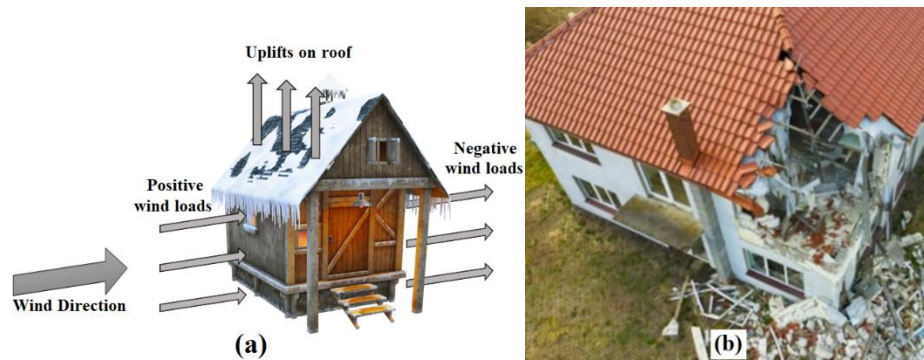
(a) Schematic of wind pressures on a building (b) A building's roof damaged by the strong wind ([FStockLuk](#)).
